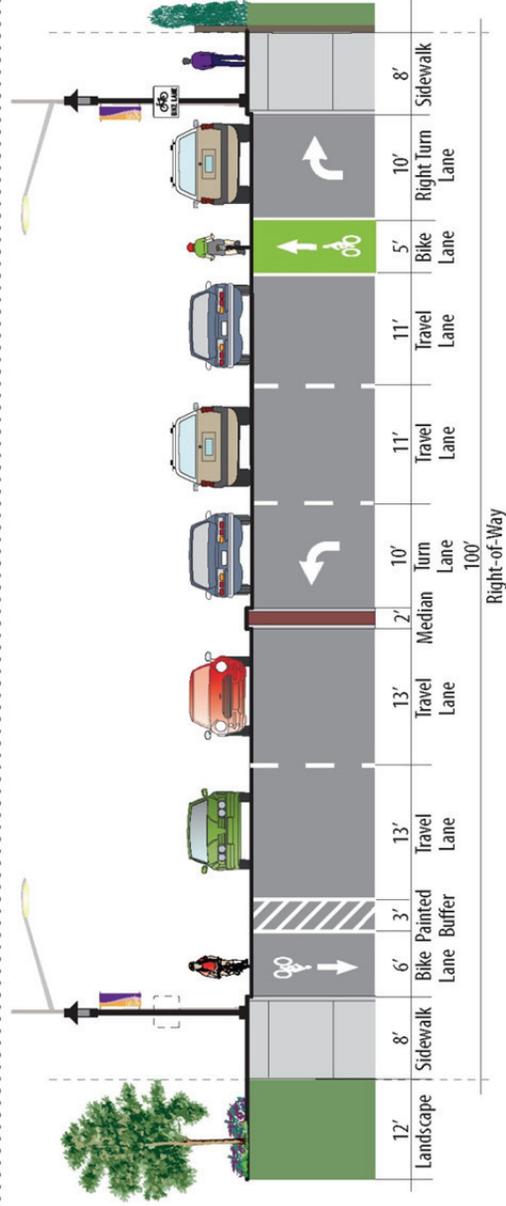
Proposed Bikeway Improvements, Section B – Kanan Road Intersection
